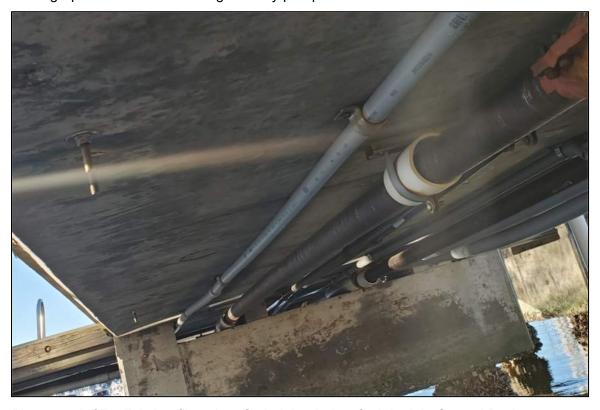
Existing comingled utility piping under piers at Central Basin.
